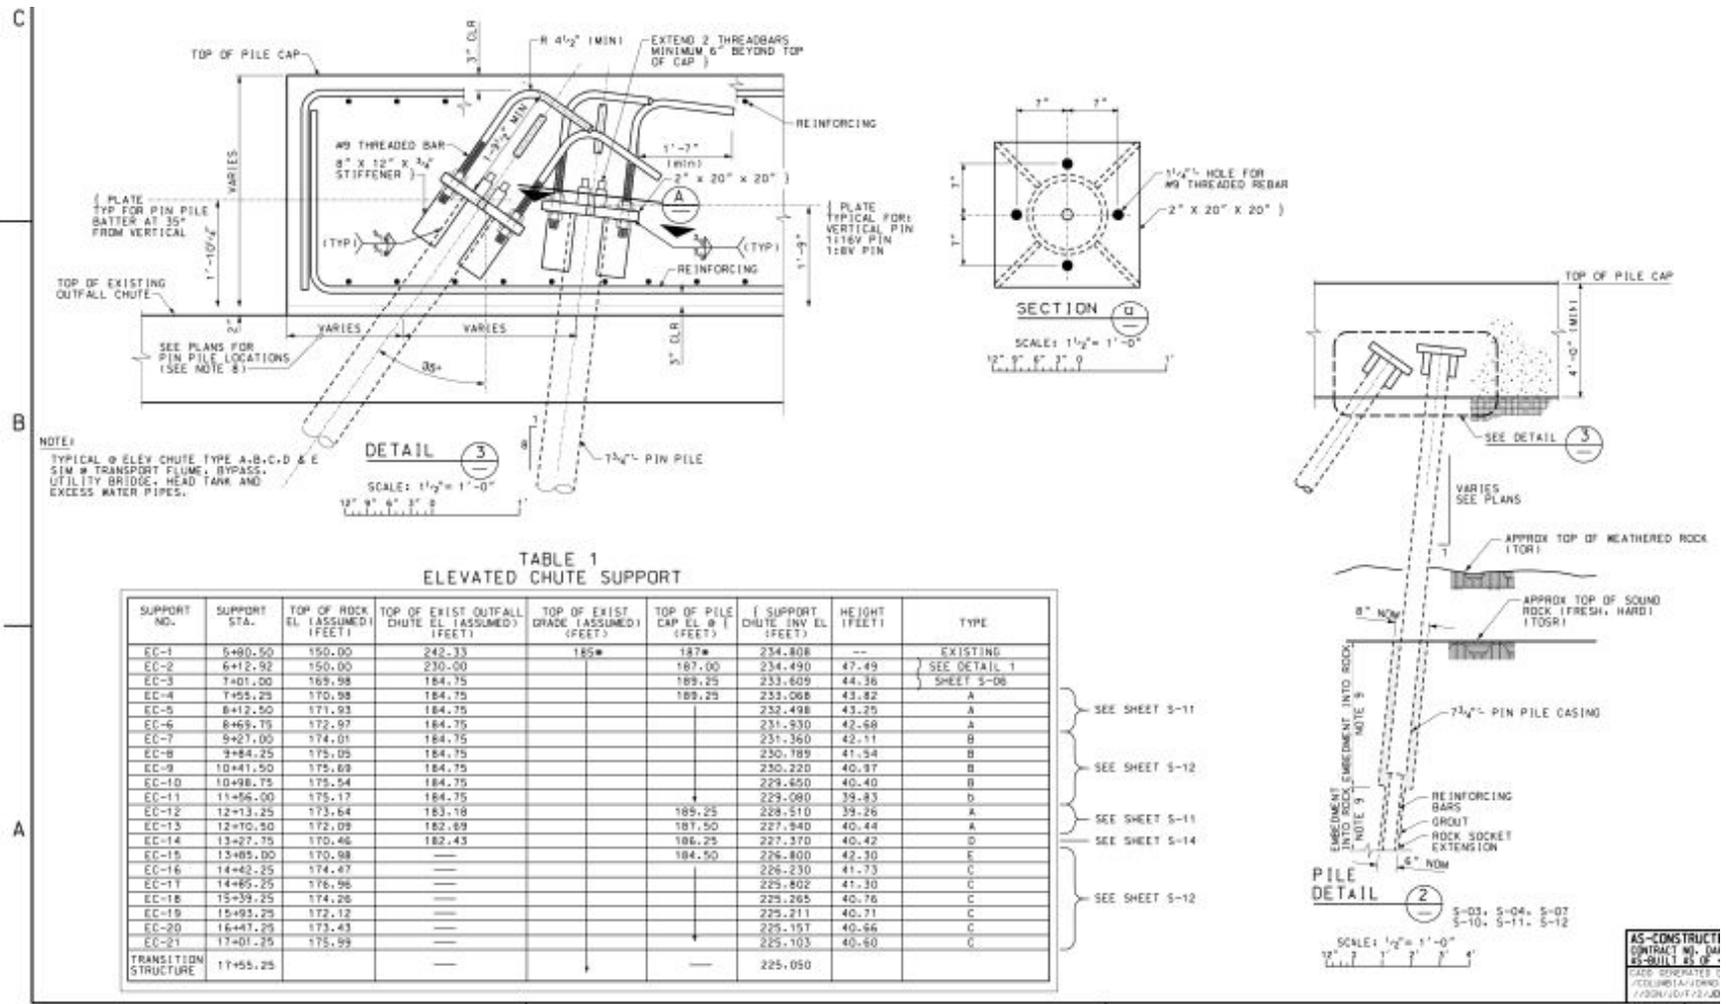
Pile Foundation EC-2 Details and Assumed Rock Elevations, JDF2-10/24
